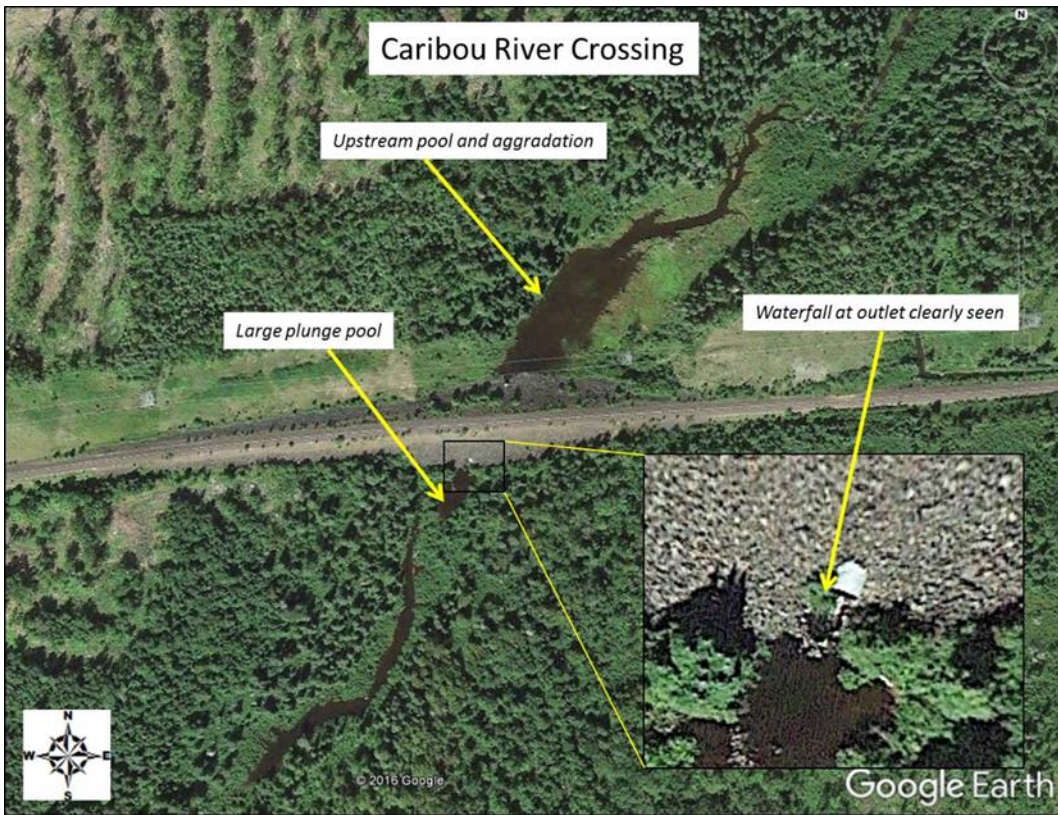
Aerial photo of Caribou River RR crossing, showing large plunge pool, visible waterfall at outlet, and large ponded area upstream.
